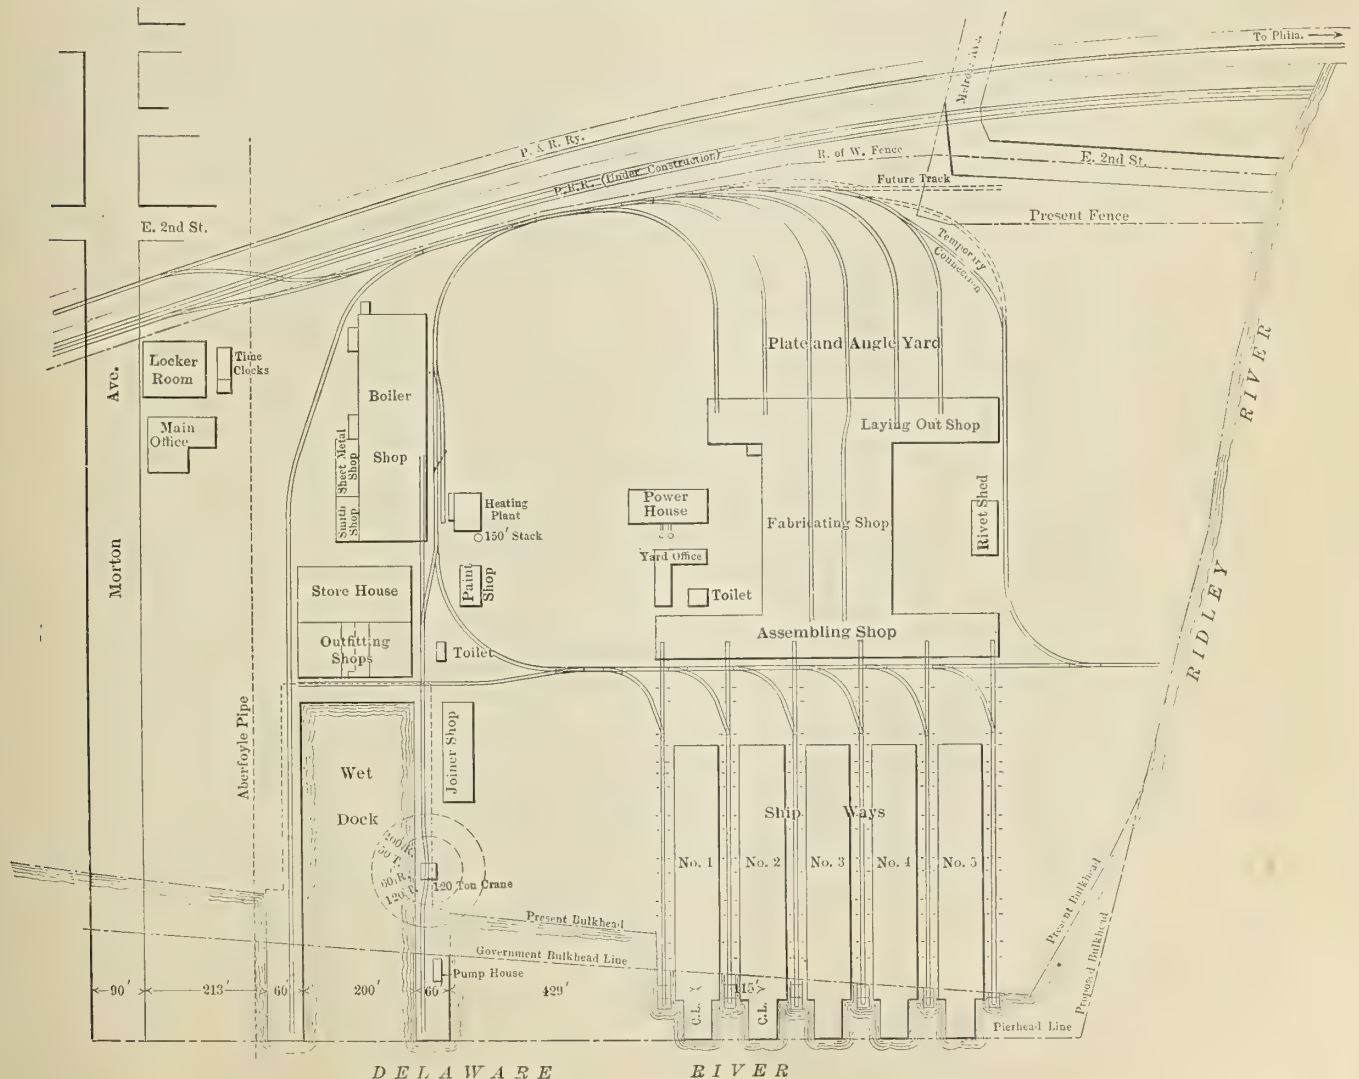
General Layout of the Yard, Showing Location of Buildings and Railroad Connections
